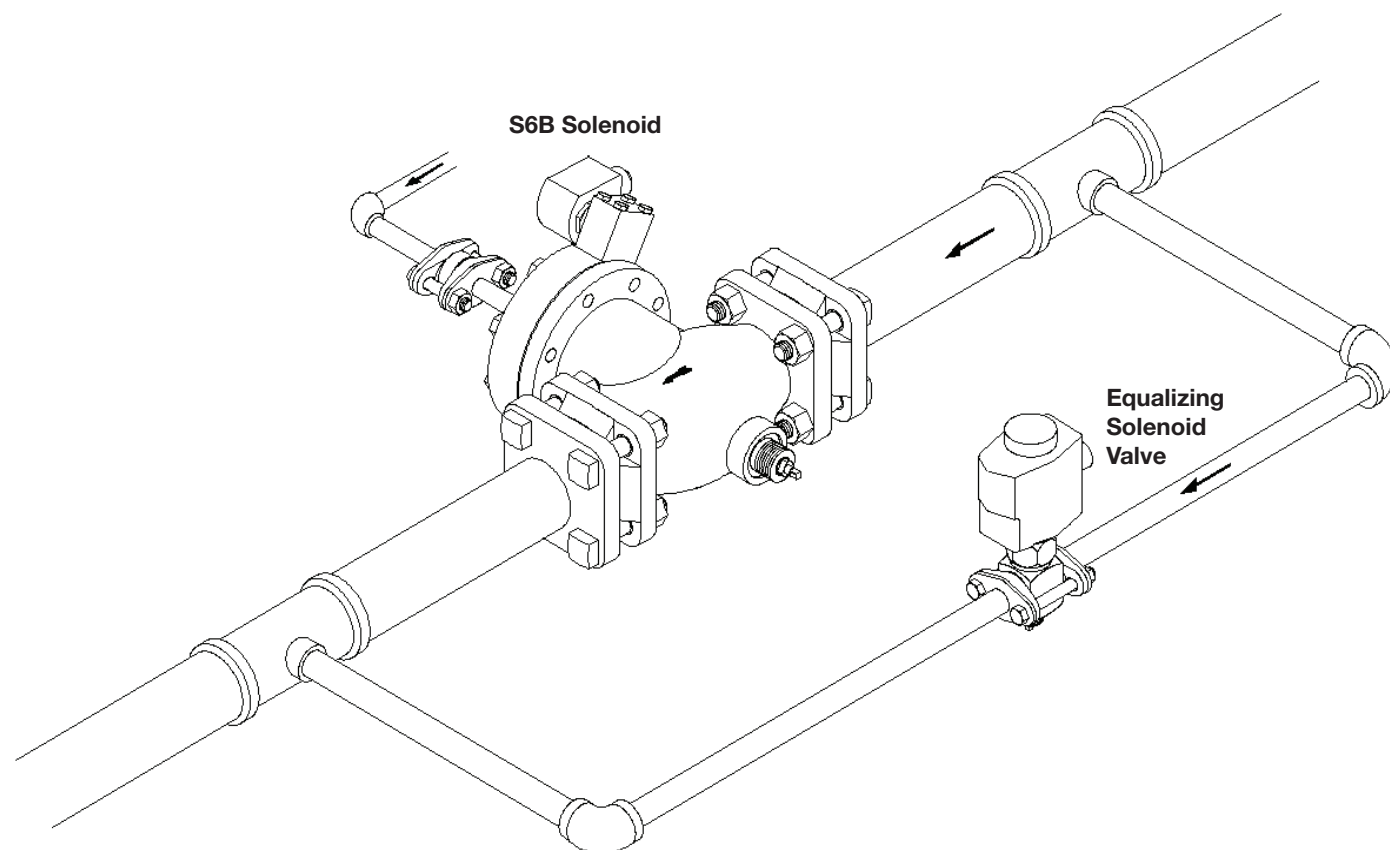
Installation Position (Horizontal) for a CK-5 32mm to 100mm (1-1/4" to 4") Port Size with S6B Solenoid
